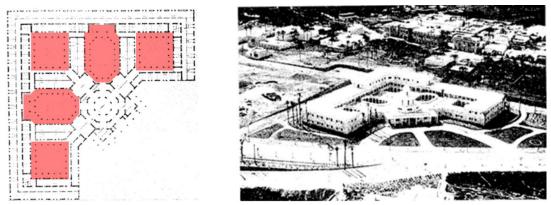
Hotel Mehari Plans and aerial view and courtyard plan, (Adapted by author, From McLaren, 2002)
